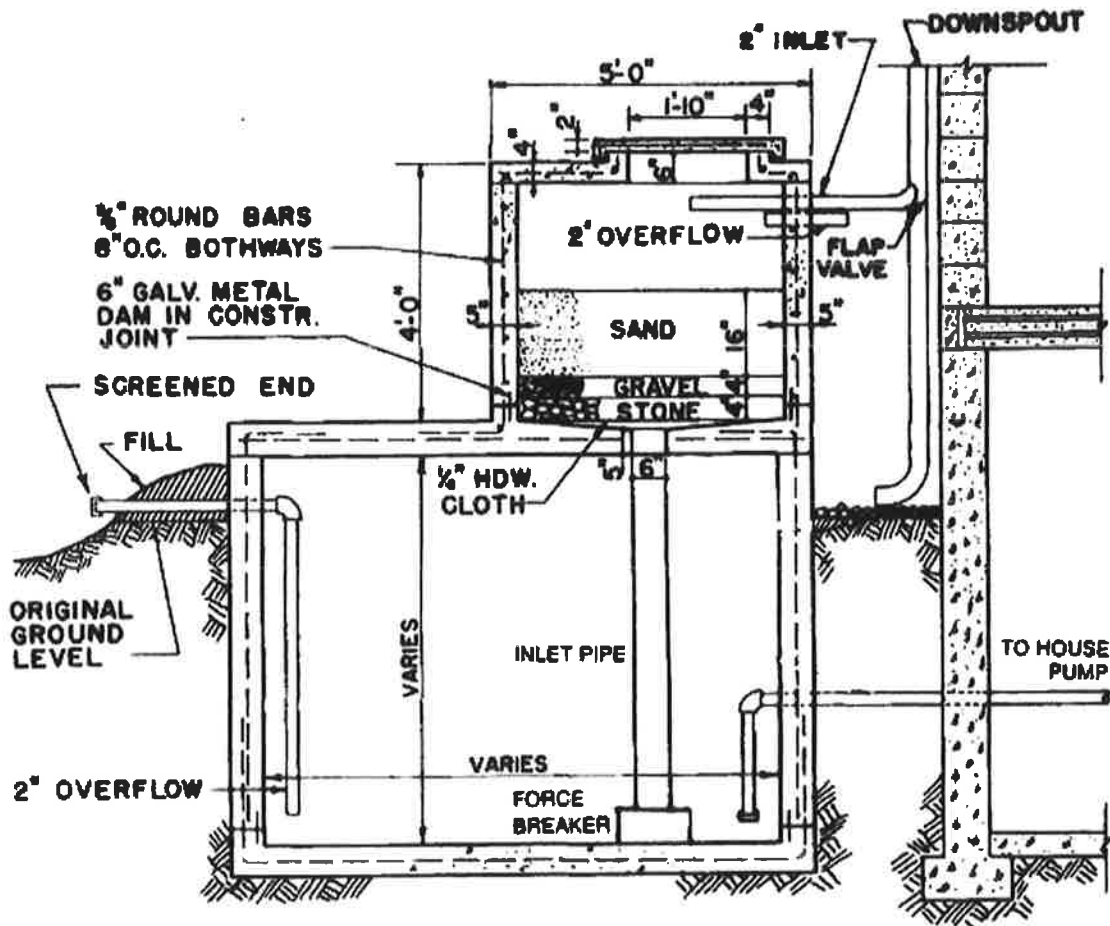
Cross section of concrete cistern with filter (Source: Penn State Ag Ext. Service, Order #800-87 Concrete Cisterns)
